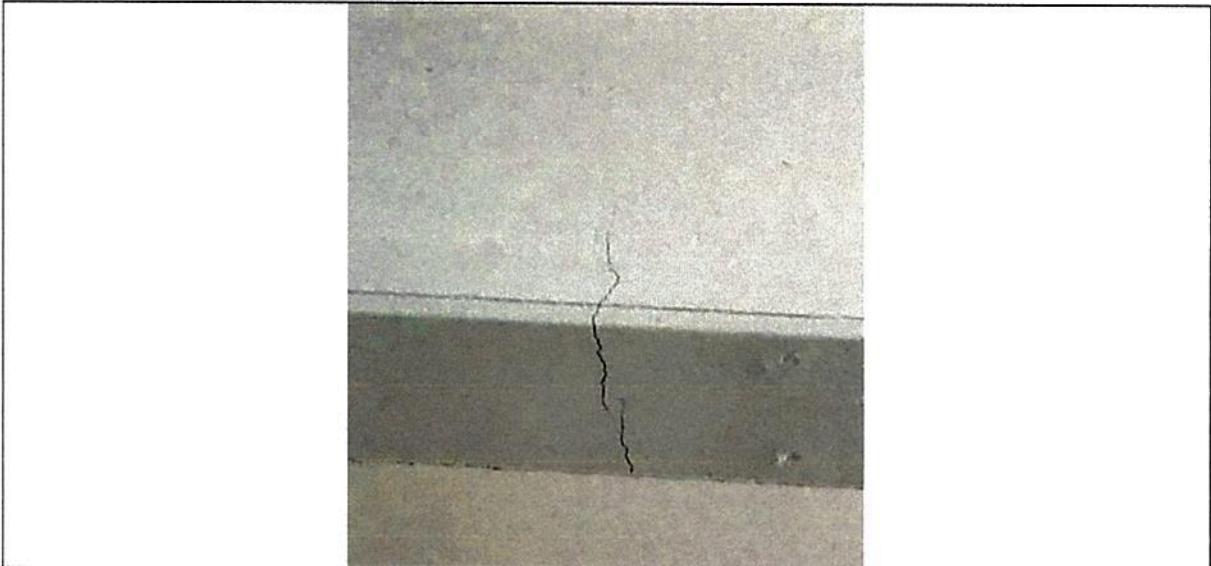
Floor and roof slab cracks at the N-E building module (Classrooms)
